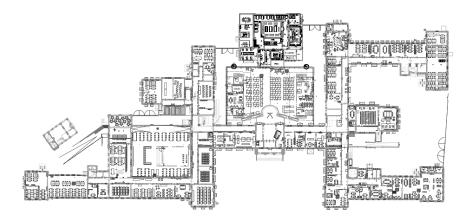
2D floor plan provided by administration of the Faculty of Architecture and the Built Environment.
